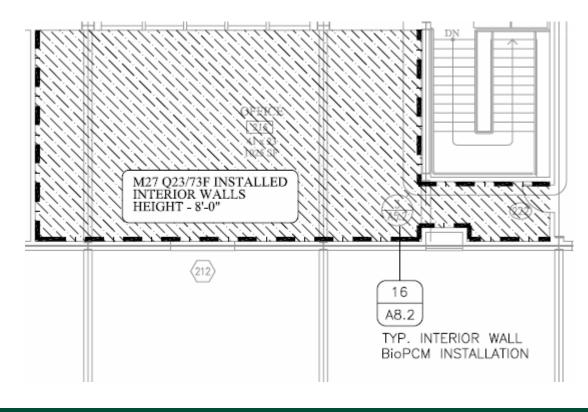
PCM INSTALLED IN THE INTERIOR WALLS OF THE NEWLY CONSTRUCTED TRAINING CENTER
